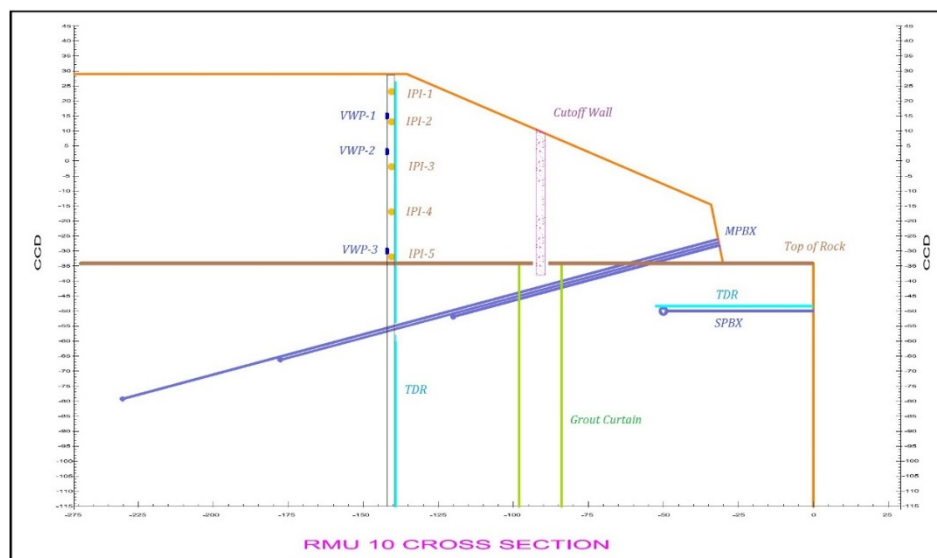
Typical Cross-section Showing Extensometer and Inclinometer Installation
